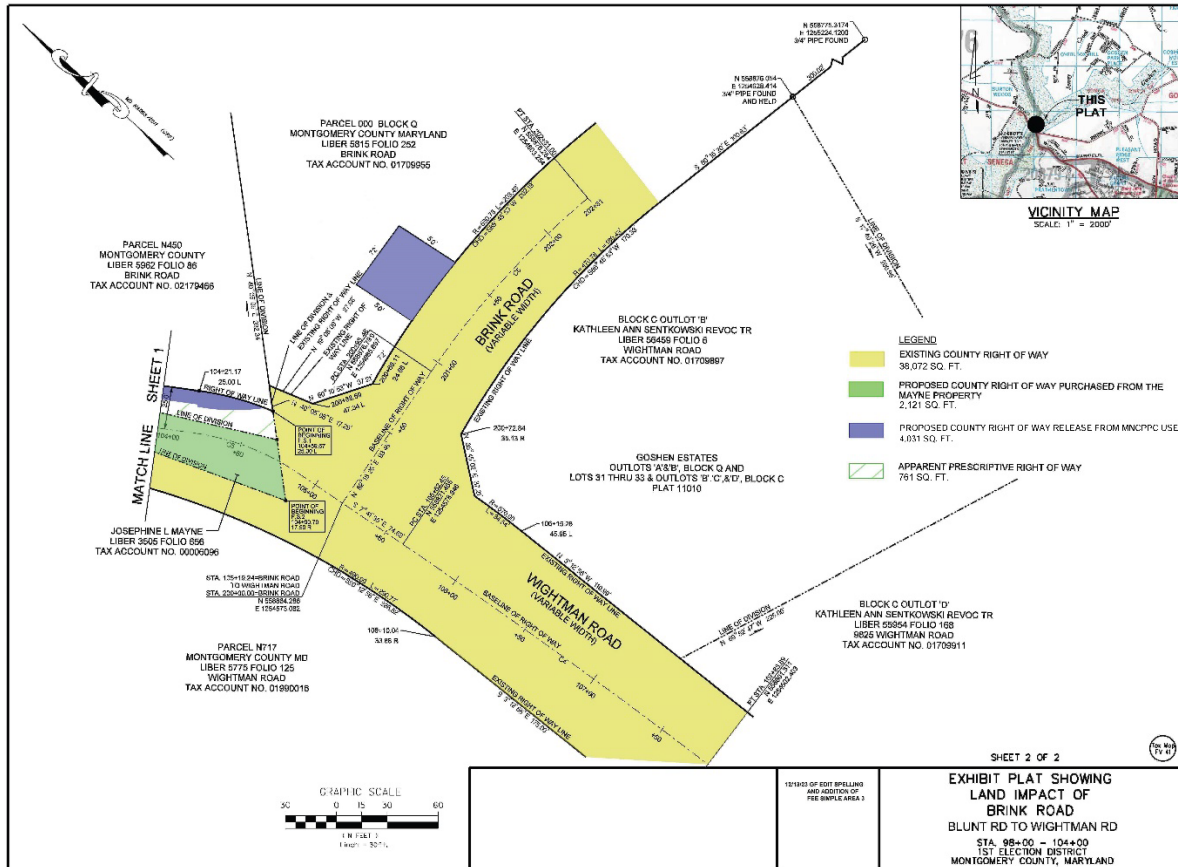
Parkland to Be Converted to MCDOT Right-of-Way (Sheet 2 of 2)
